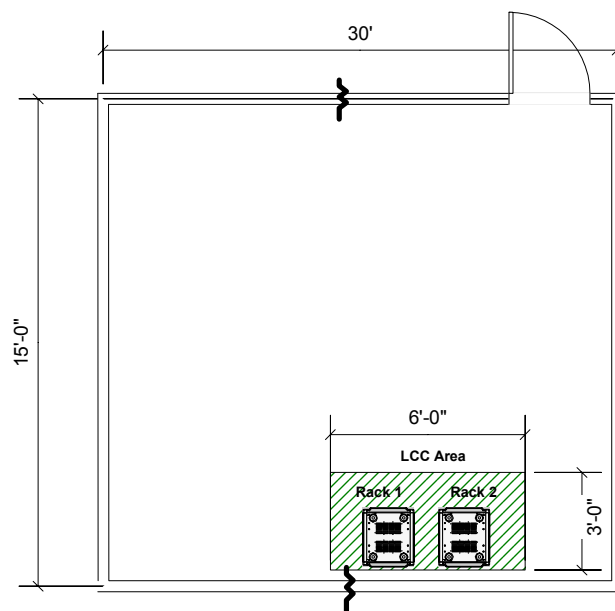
LCC Layout for the City of Downey 3rd Floor
